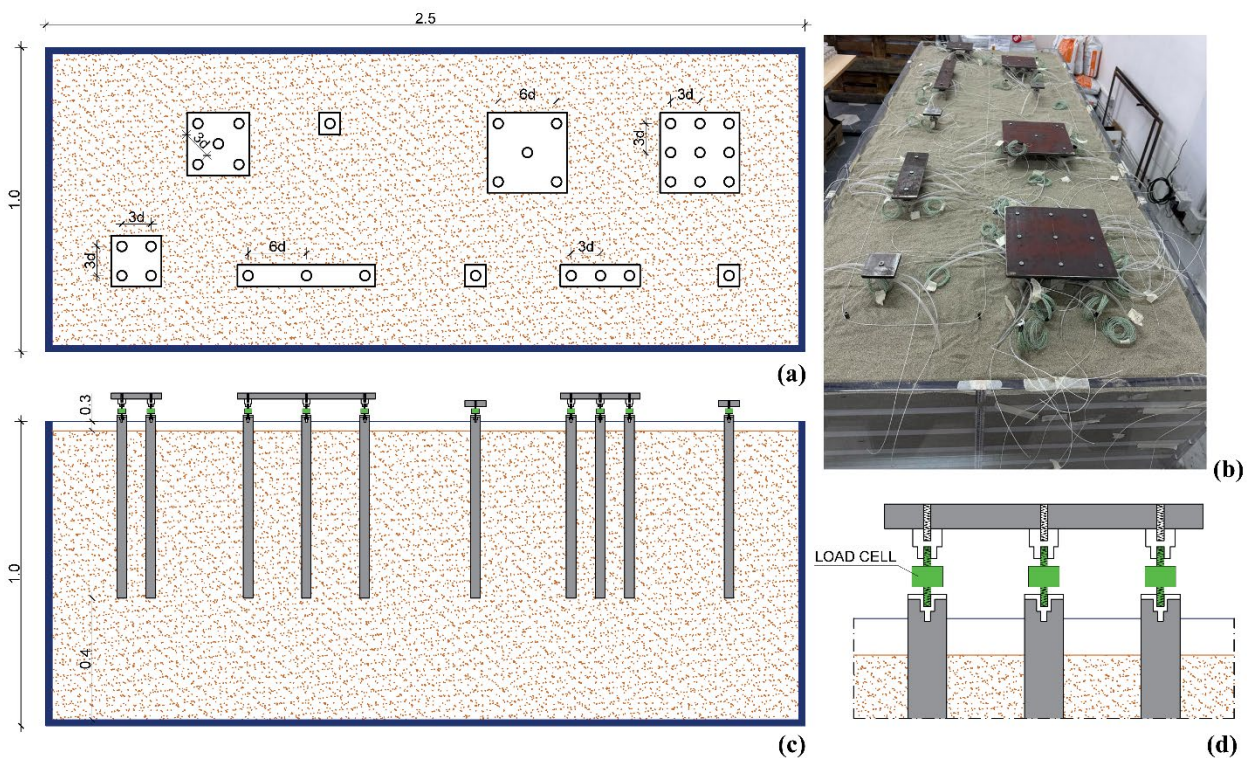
Foundation layout: (a) plan view; (b) photo of the assembled box; (c) lateral view; (d) detail of load cell connection at pile head.
